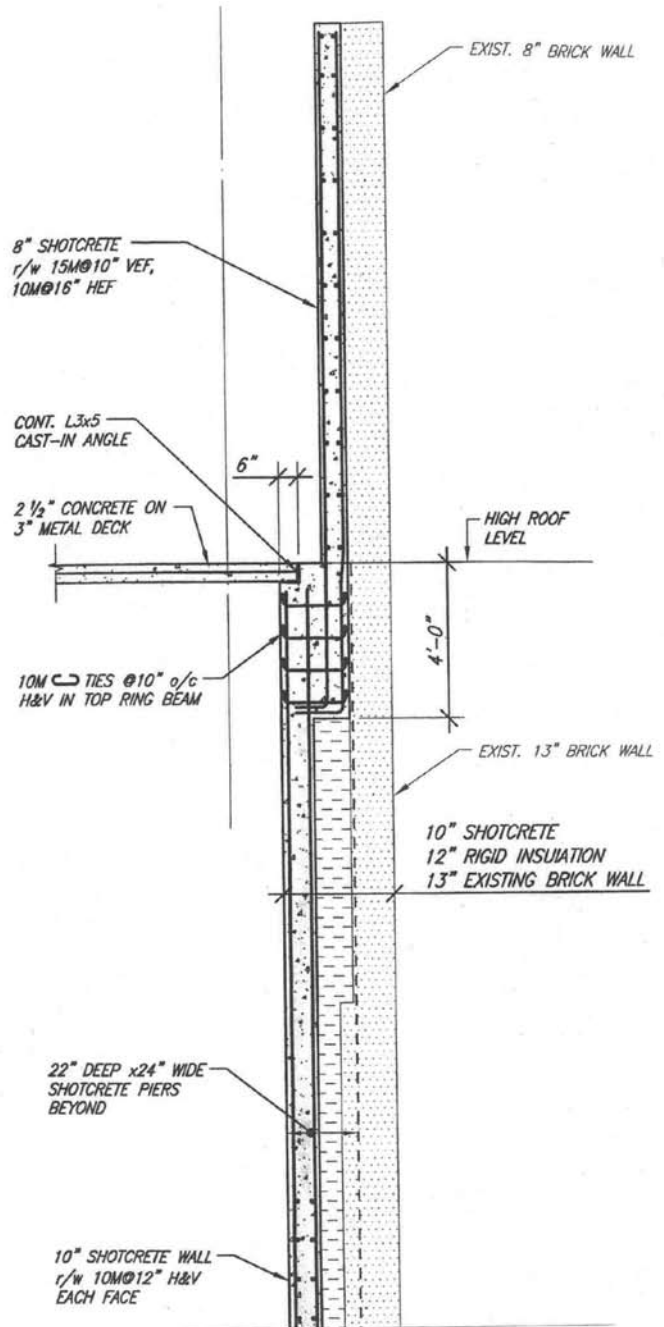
Section detail of ring beam at roof level and reinforced shotcrete wall and parapet
